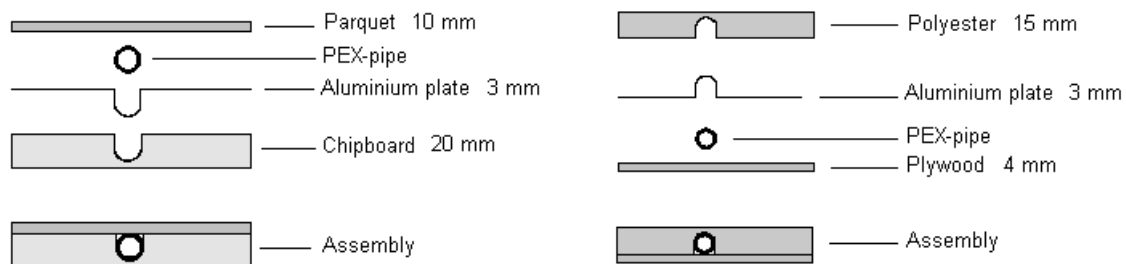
Embedded pipe system: floor structure (left) and ceiling structure (right)
